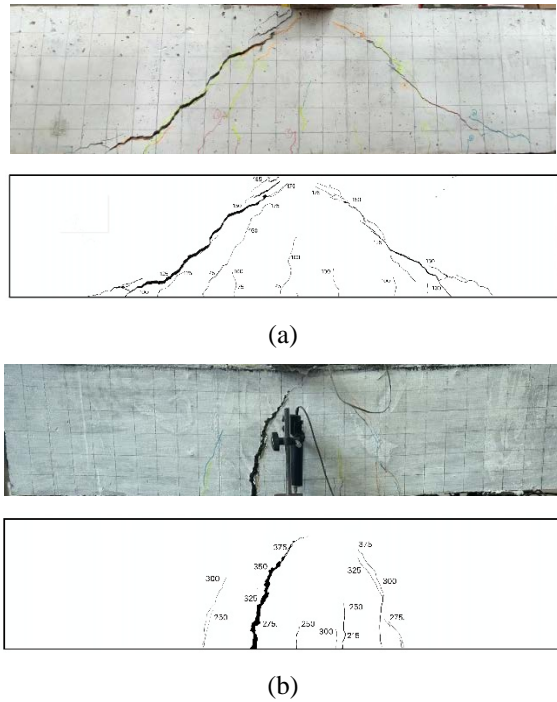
Final Crack Patterns of: (a) Control Beam; (b) Retrofitted Beam
